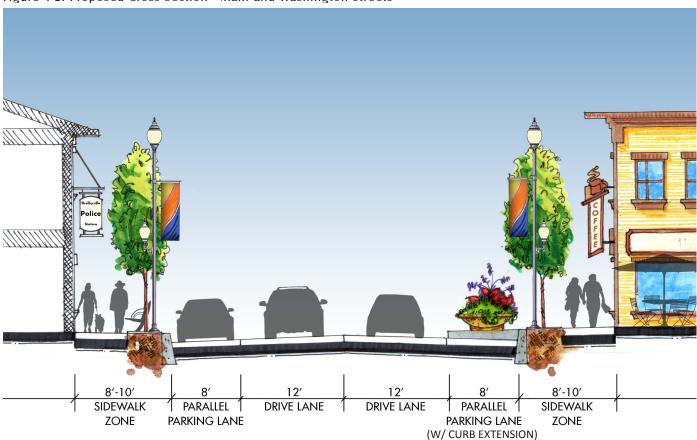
Proposed Cross Section - Main and Washington Streets
